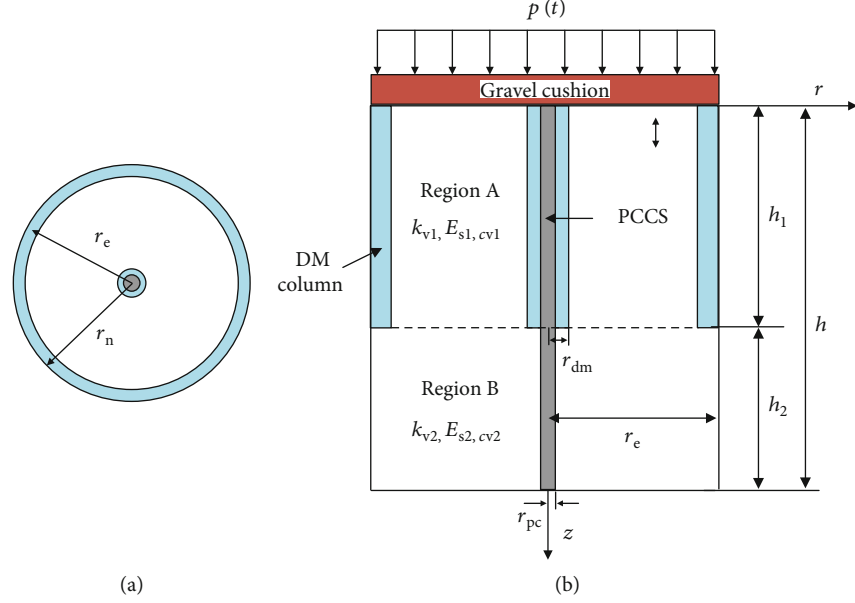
Schematic diagram of consolidation model; (a) plan view; (b) elevation plan.
